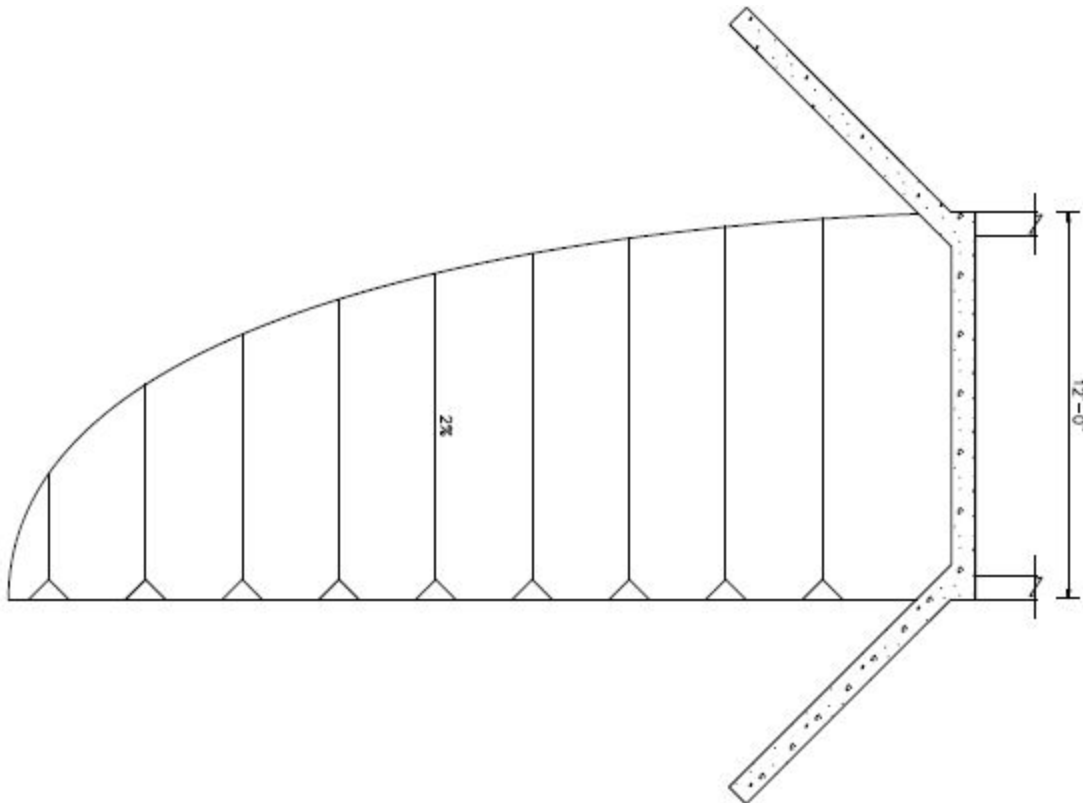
Demonstrates slope approaching the culvert on the western side to lead water towards the gutter inside.
